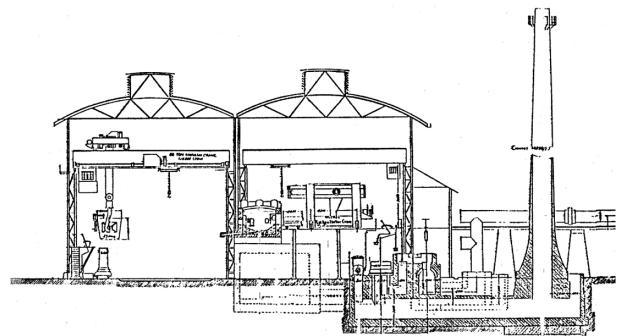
Drawing of No. 1 Steel Making Plant⁵⁾
